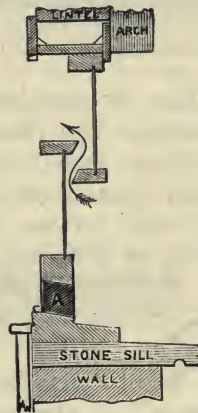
Hinckes Bird's Plan of Window Ventilation.
